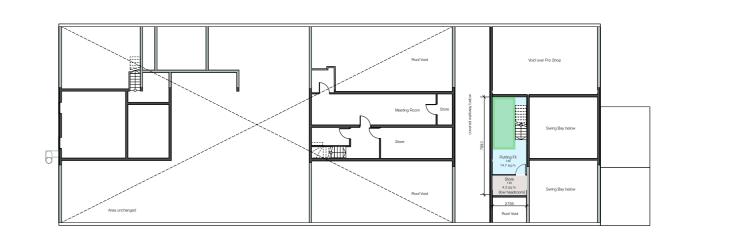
Proposed Clubhouse - Upper Ground Floor Plan
